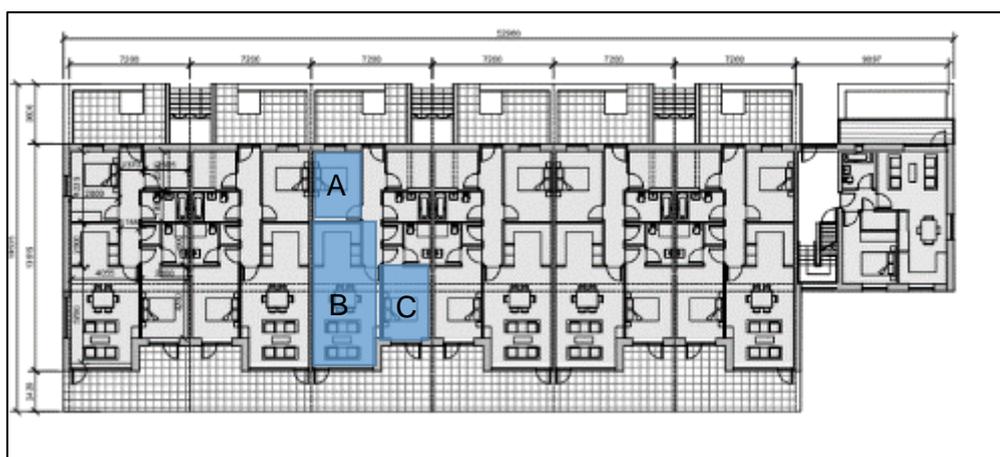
Block C1 – Ground Floor Assessed Rooms Highlighted in Blue
